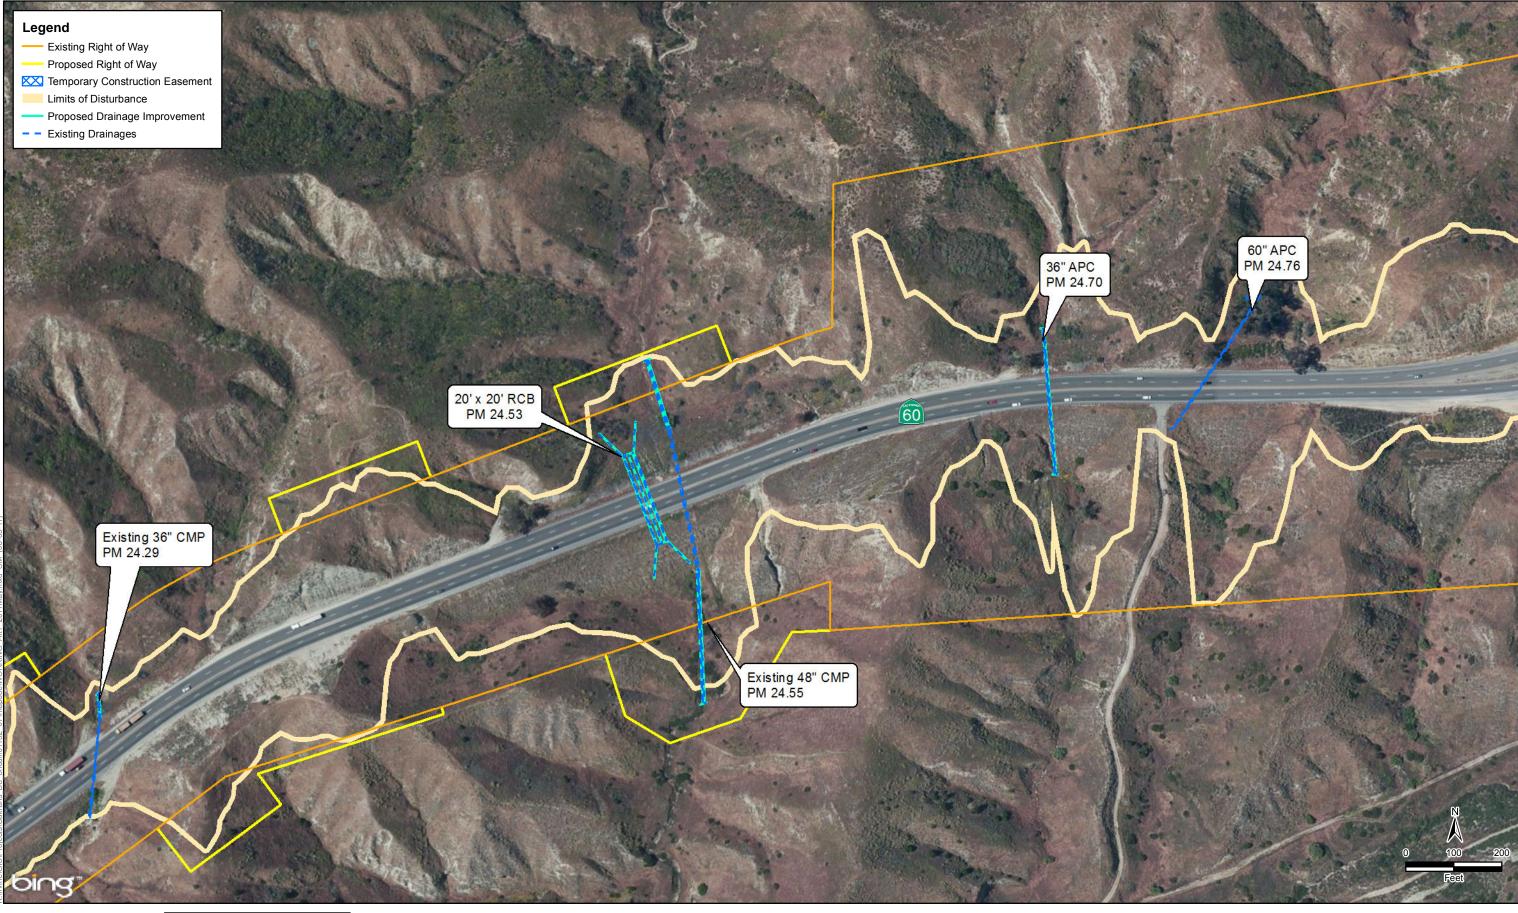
Sheet 4 of 8 Existing and Proposed Drainage Improvements State Route 60 Truck Lanes Project
